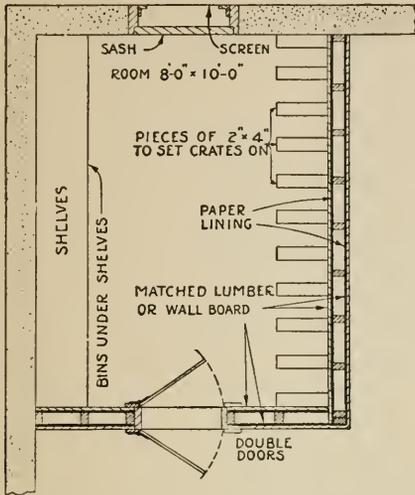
Plan of the vegetable room showing the position of the shelves, window, bins, and racks for supporting crates like the one shown in Fig. 26.
